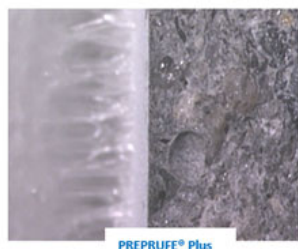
Continuous Adhesive Bond between PREPRUFE® Plus and concrete
